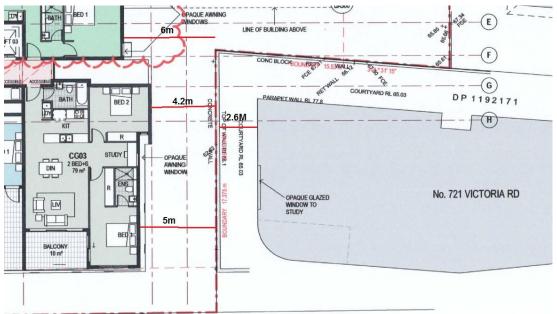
separation between adjoining site at 721 Victoria Road. One window facing 721 Victoria Road which is off a study area and has opaque glass.
